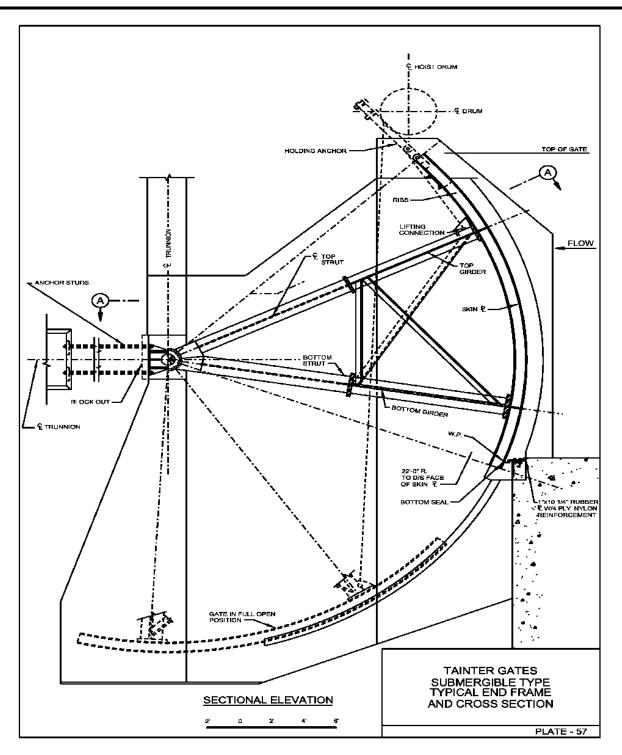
Plate 57: Tainter gates, submergible type, typical end frame and cross section
